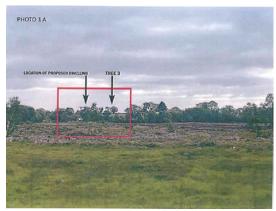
Site identified and agent has superimposed dwelling in view from Derryloughan Road/Ferry Road junction.
